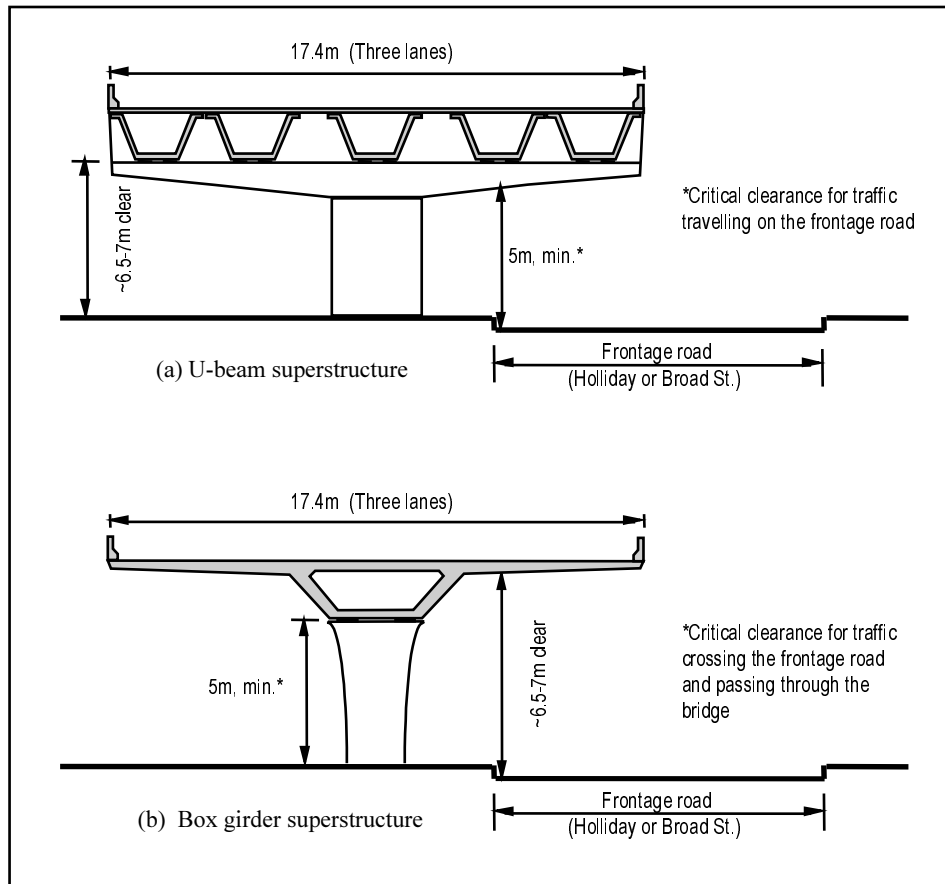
Improved frontage road clearance when changing from a U-beam design (a) to a box girder design (b).
